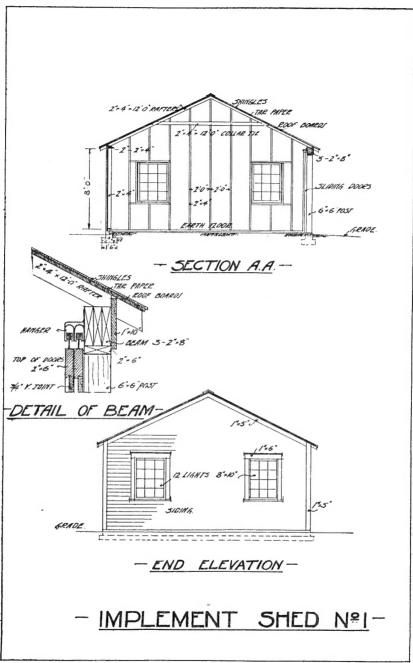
Showing the simple frame construction and the manner of building the beam above the sliding doors.
